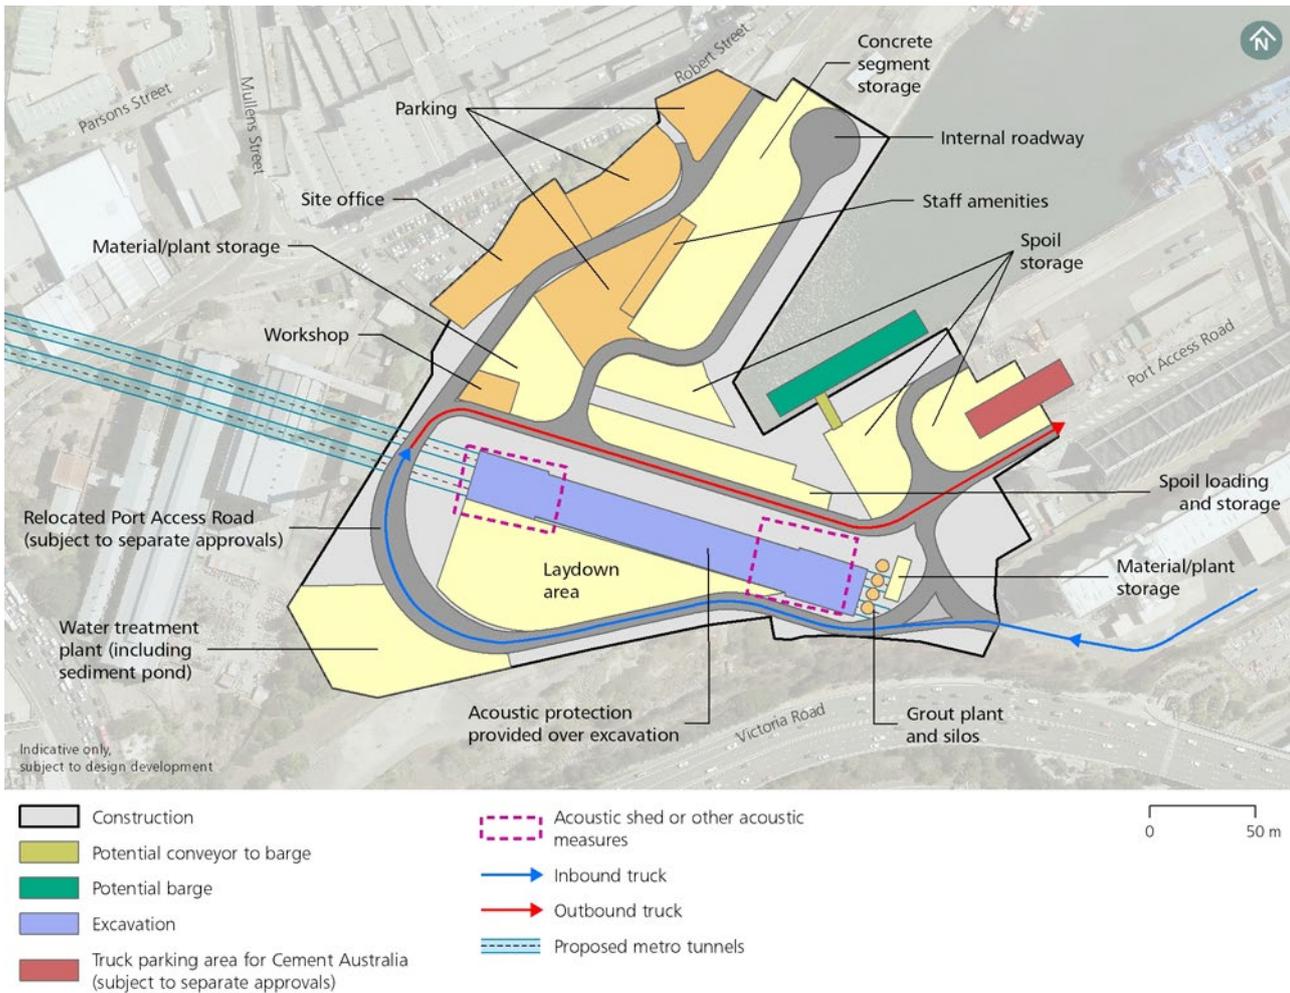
Exhibited The Bays Station indicative construction site layout
